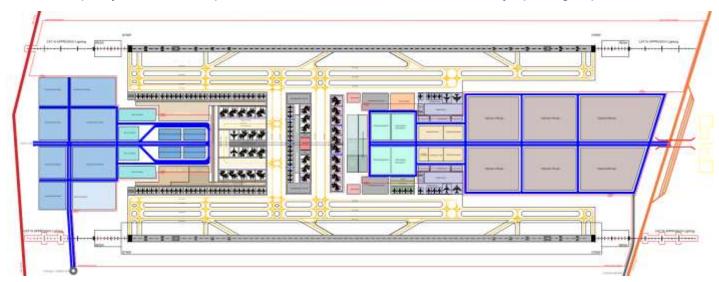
Airport Precinct Layout Plan for 45mppa.
